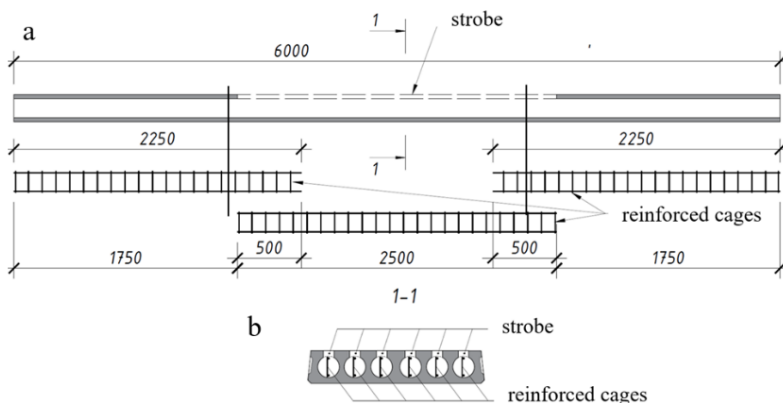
Scheme of slab reinforcement: above – longitudinal section; below – transverse section
